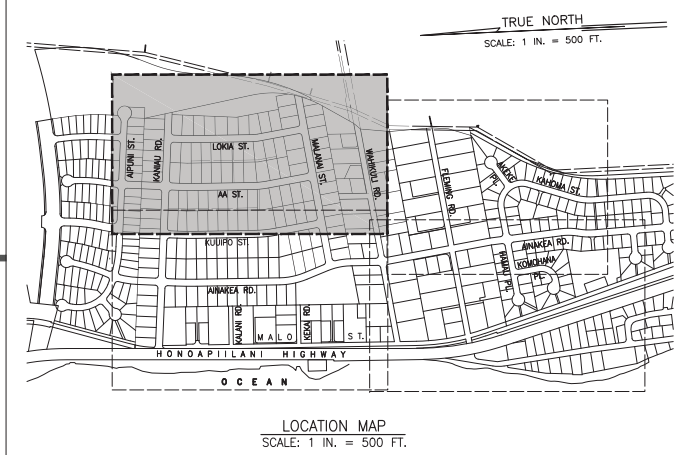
EXHIBIT B - OVERALL SITE PLAN (1 OF 4)
